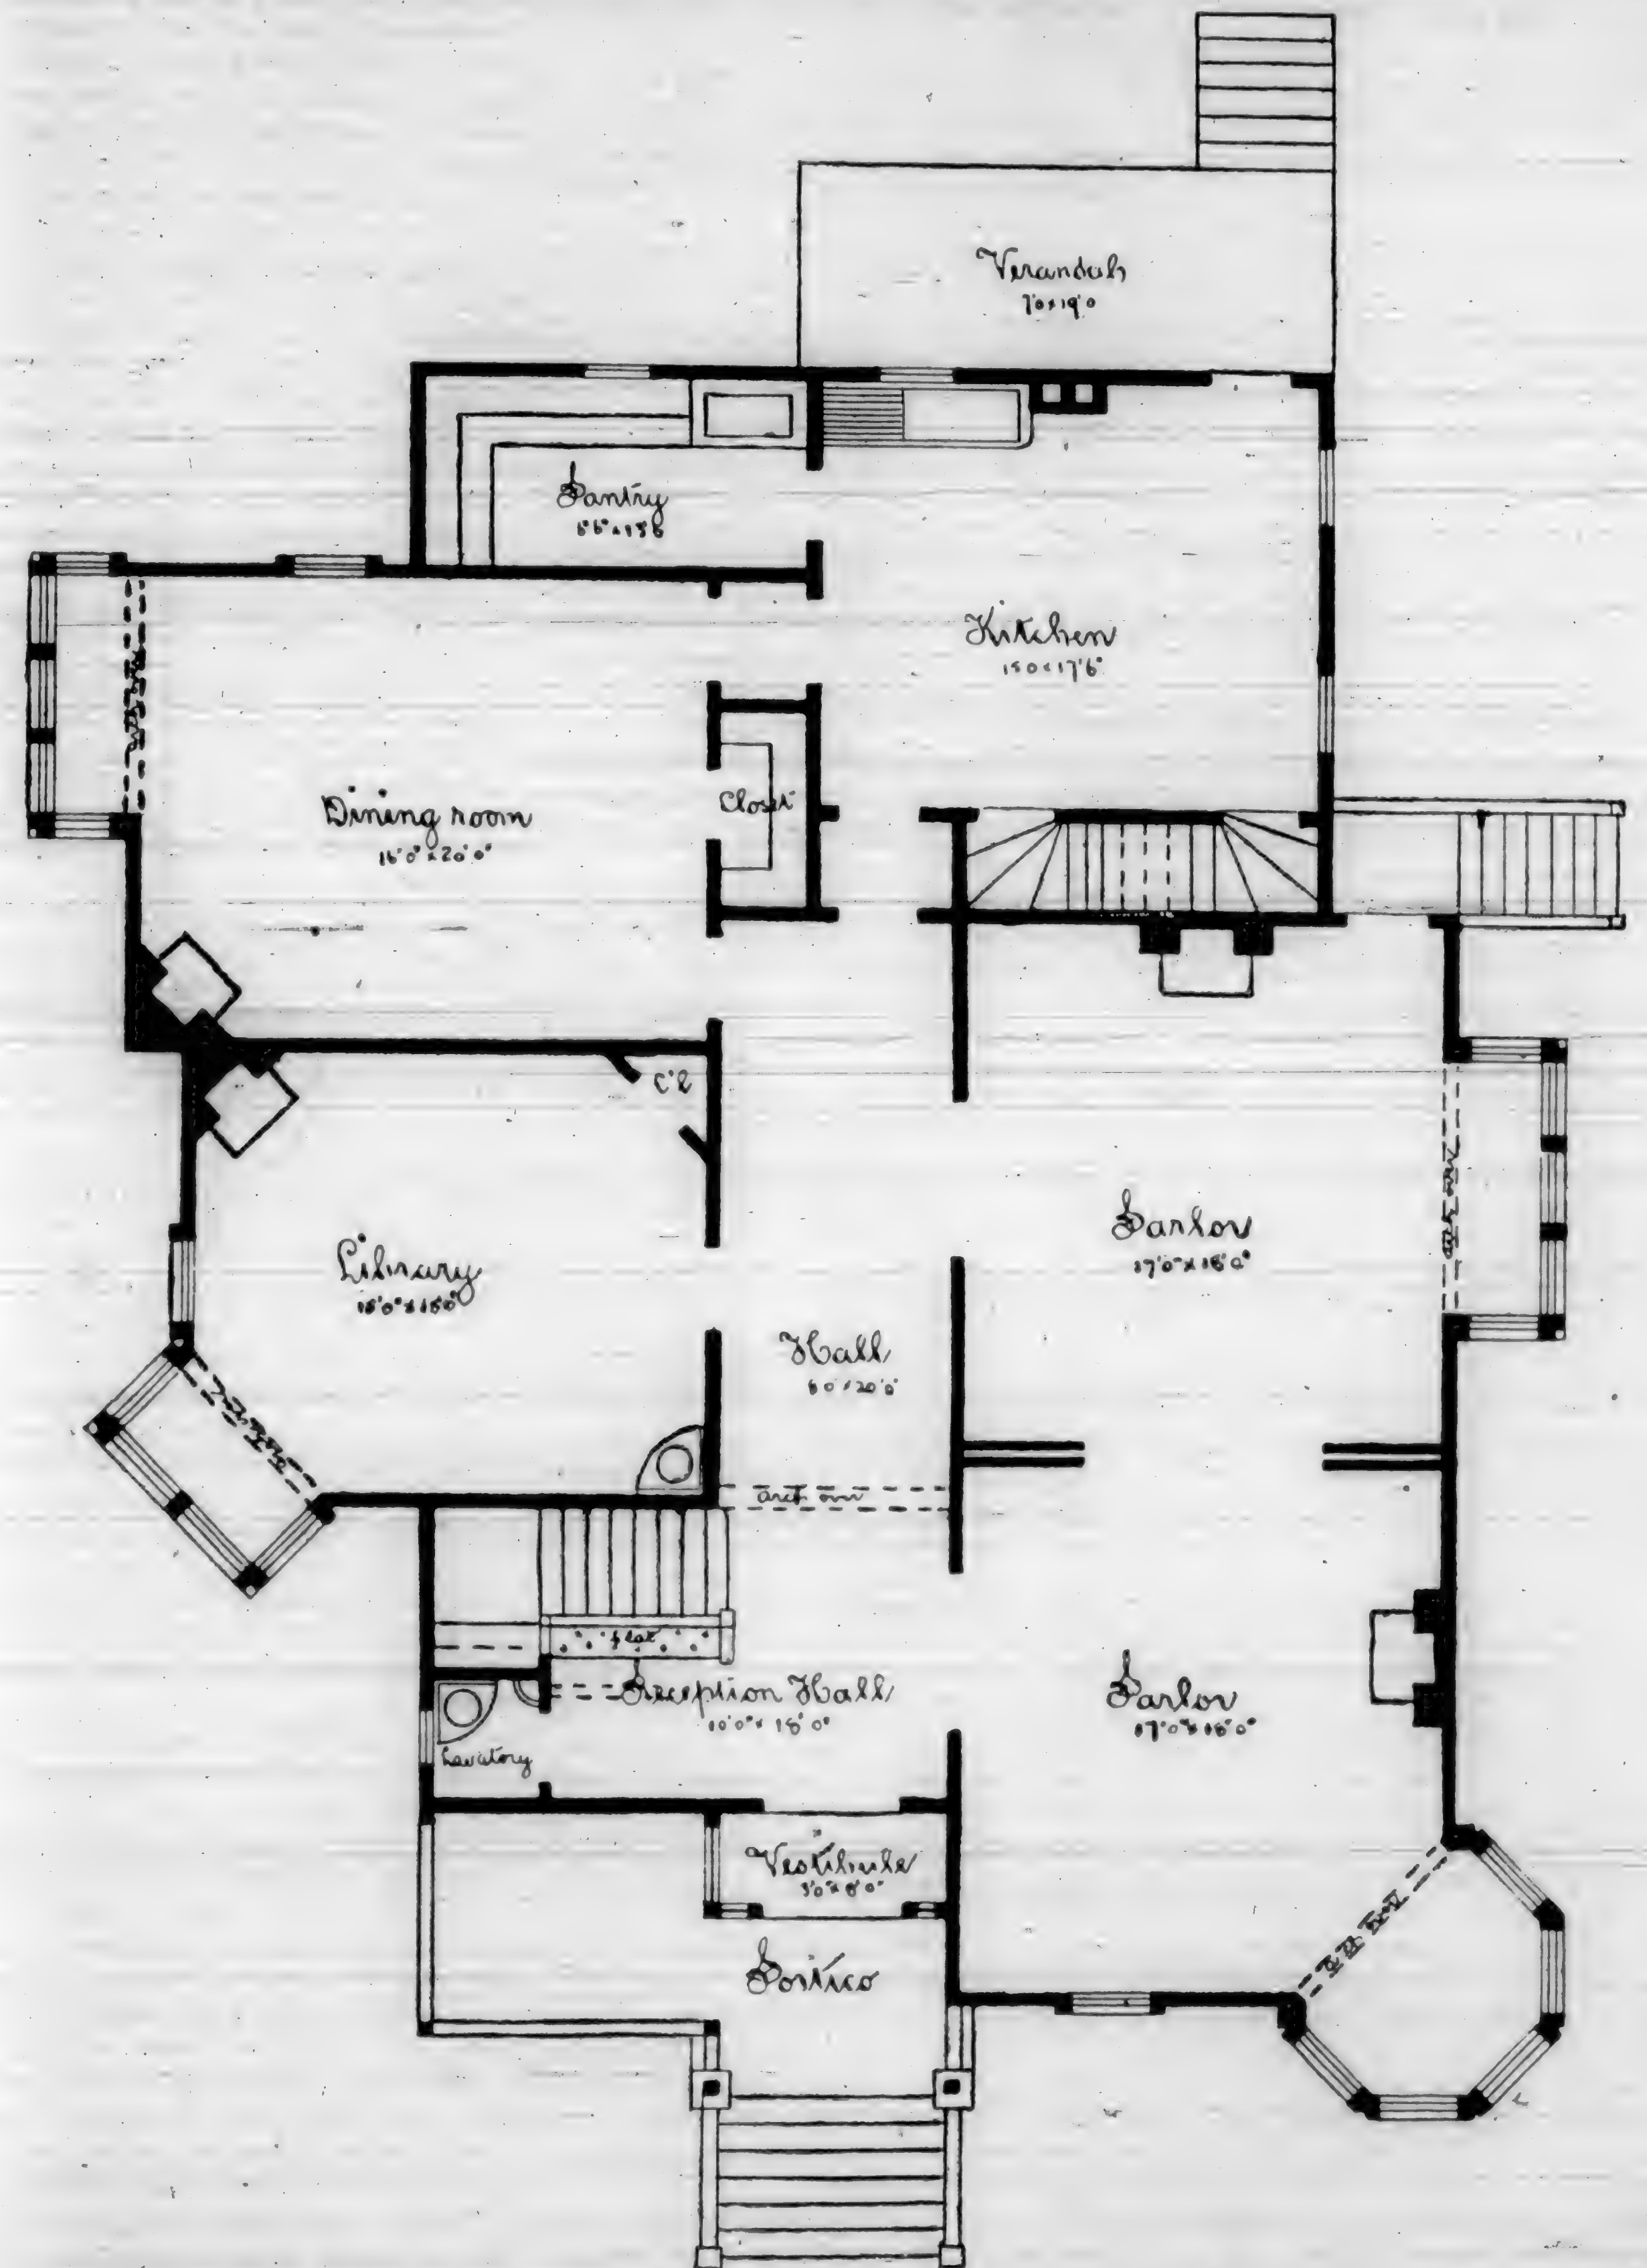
FIRST FLOOR PLAN OF SUBURBAN RESIDENCE.
